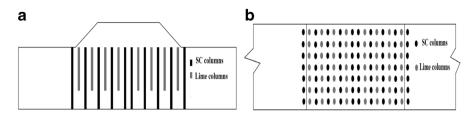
a Elevation showing position of columns in foundation soil as per arrangement A. b Plan showing position of columns in foundation soil as per arrangement A
